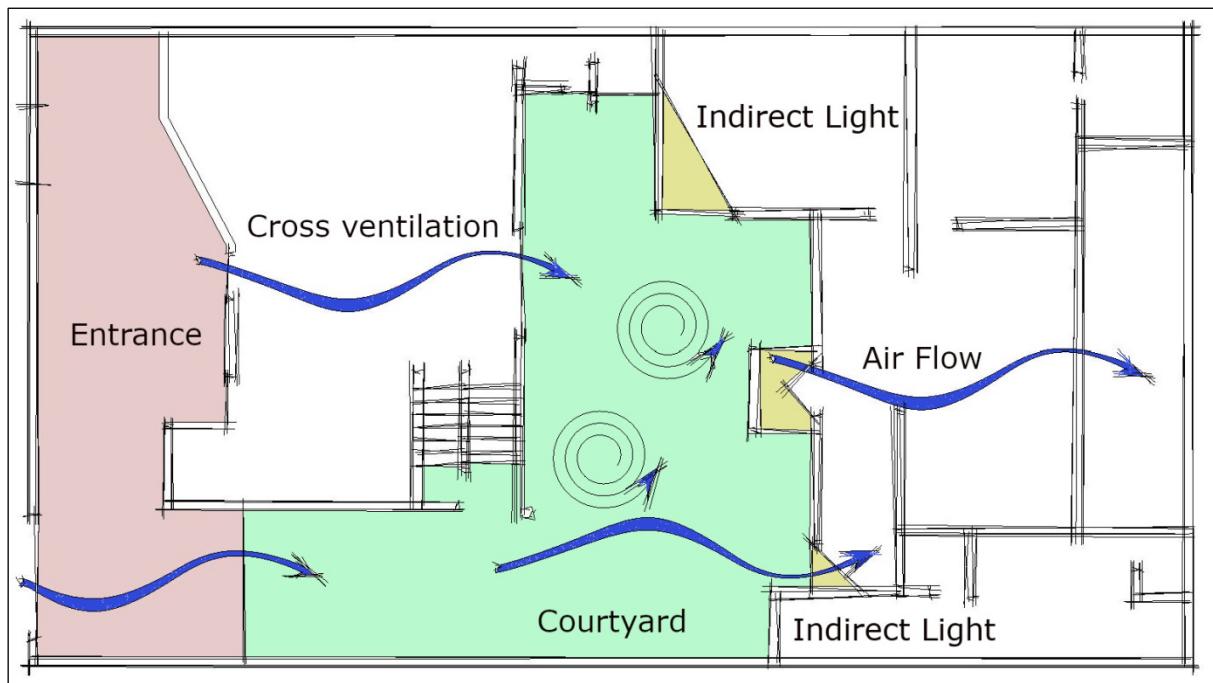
House plan example shows the ventilation of airflow through the courtyard
